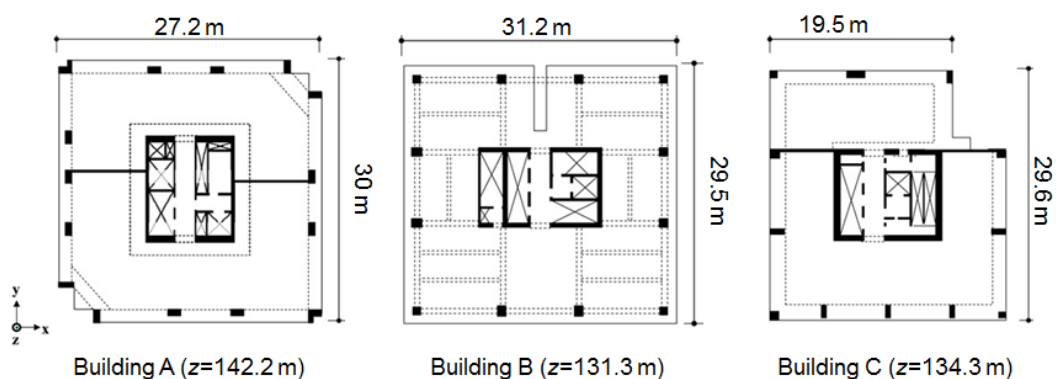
Typical floor plans of three tall building modelled by Kim *et al.* (2009).
